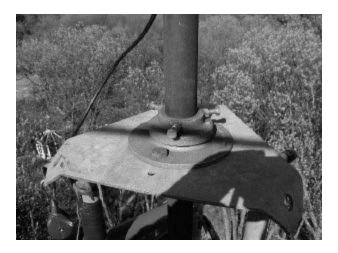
Detail view of thrust bearing mounted on top of tower top section.
